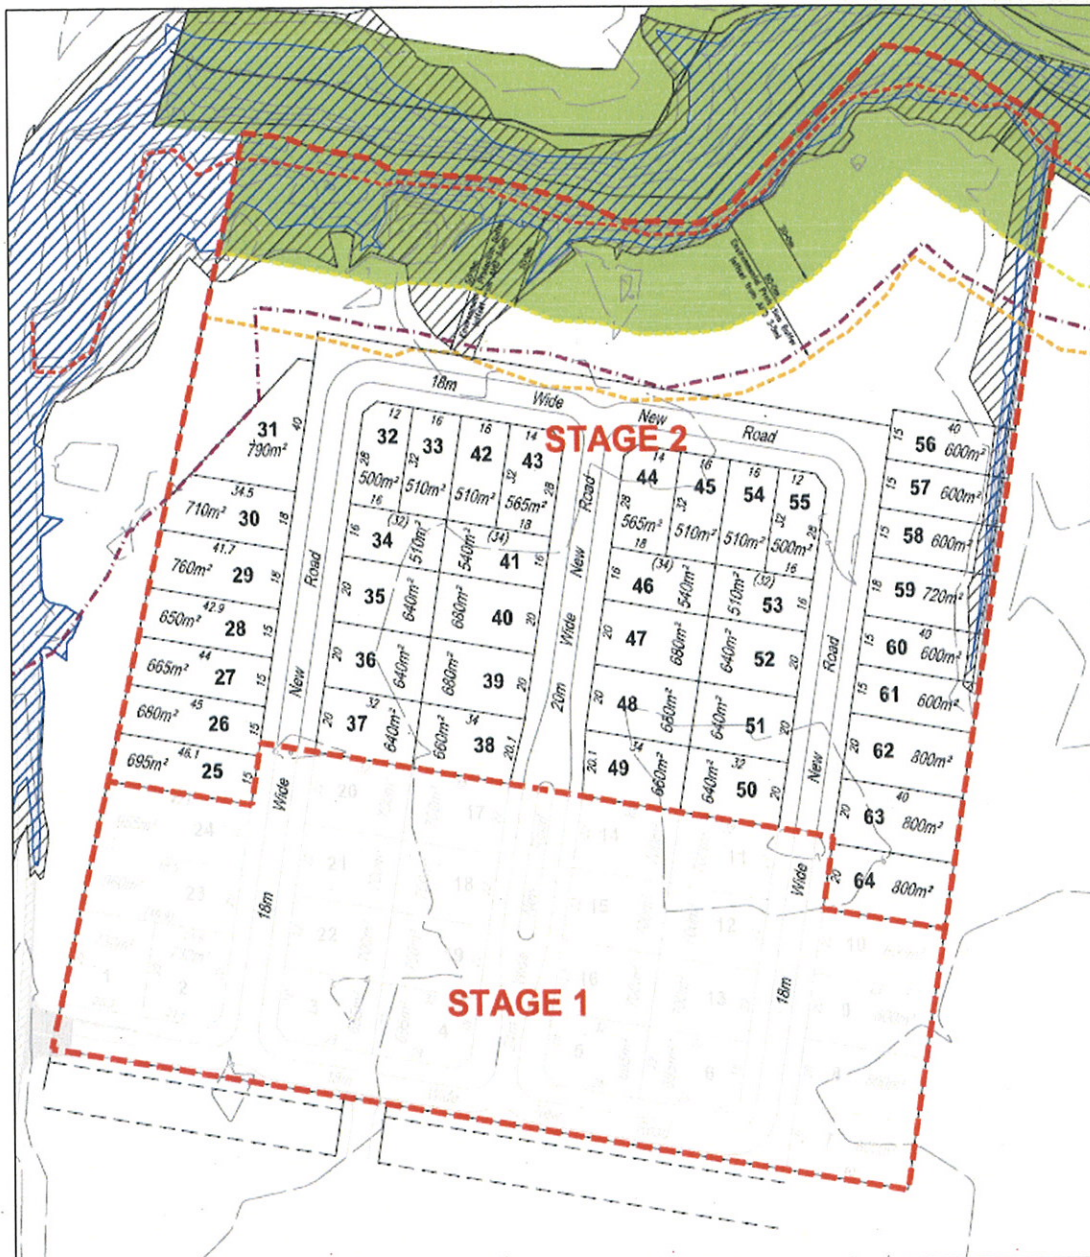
Site Zoning and Subdivision Layout as Initially Proposed (source: Environmental Assessment)
